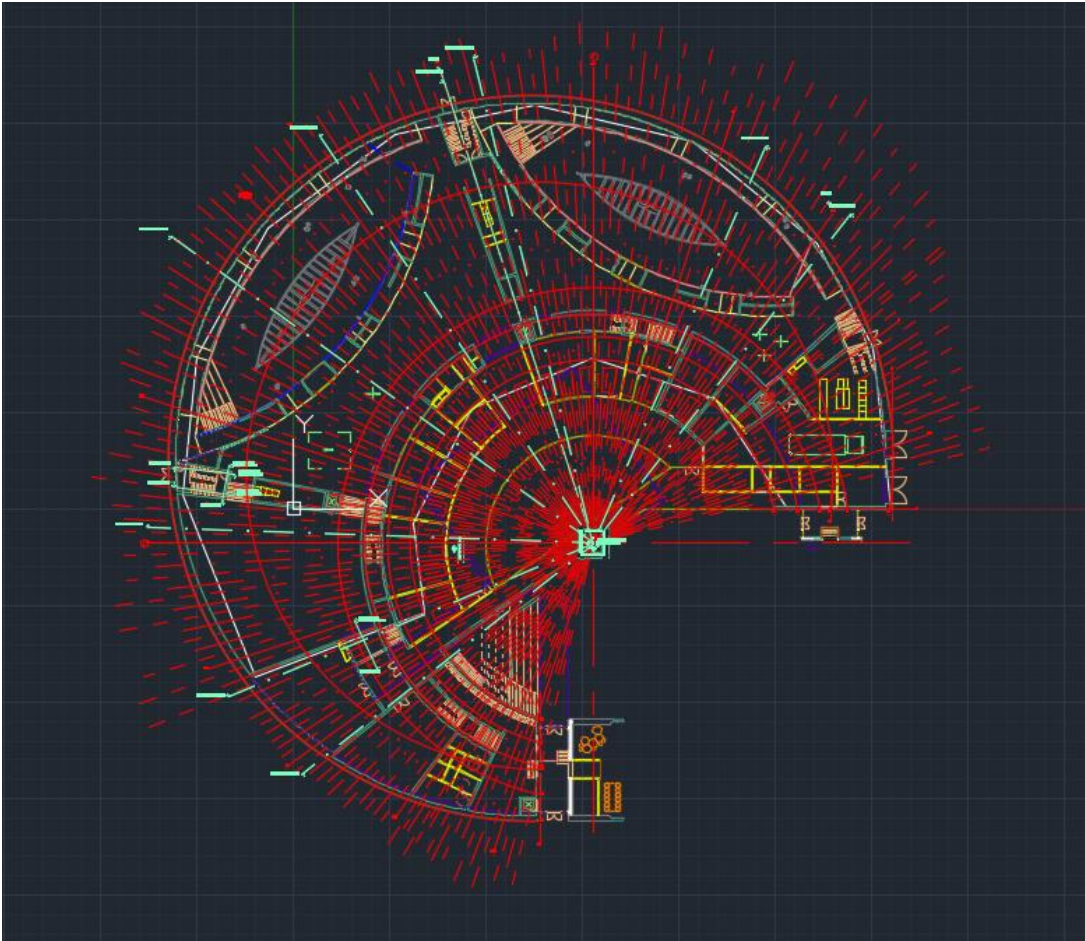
Floor plan of level U1, exported from Revit and imported in AutoCad
